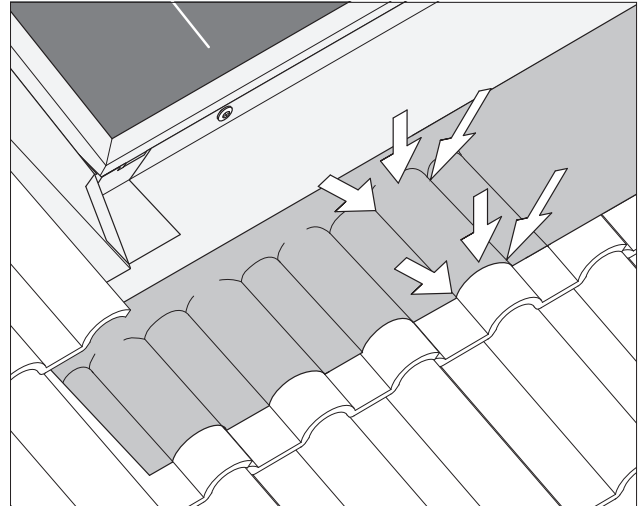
Remove adhesive protection foil from lower aluminum skirting and press to surface of tiles.
